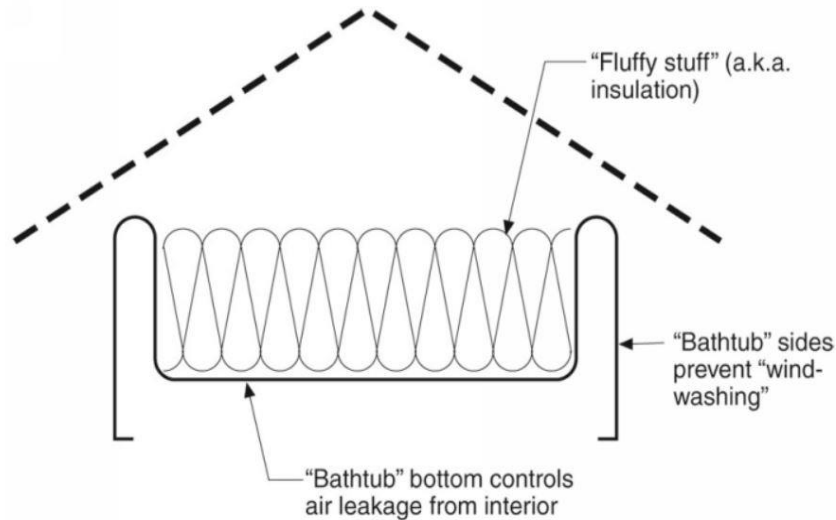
"The Bathtub Principle"—With vented attics it is real important to have a continuous air control layer (aka "air barrier") at the ceiling plane. It is also real important to prevent wind from blowing through the insulation at the roof perimeter (aka "wind washing"). Think of the roof as a bathtub that is filled with insulation. The sides of the bathtub control wind washing and the bottom of the bathtub controls air leakage from the interior.
